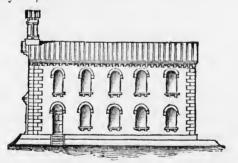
Design No. 35.—Side Elevation of a Two-storey School-House, adapted to Fig. 128.
